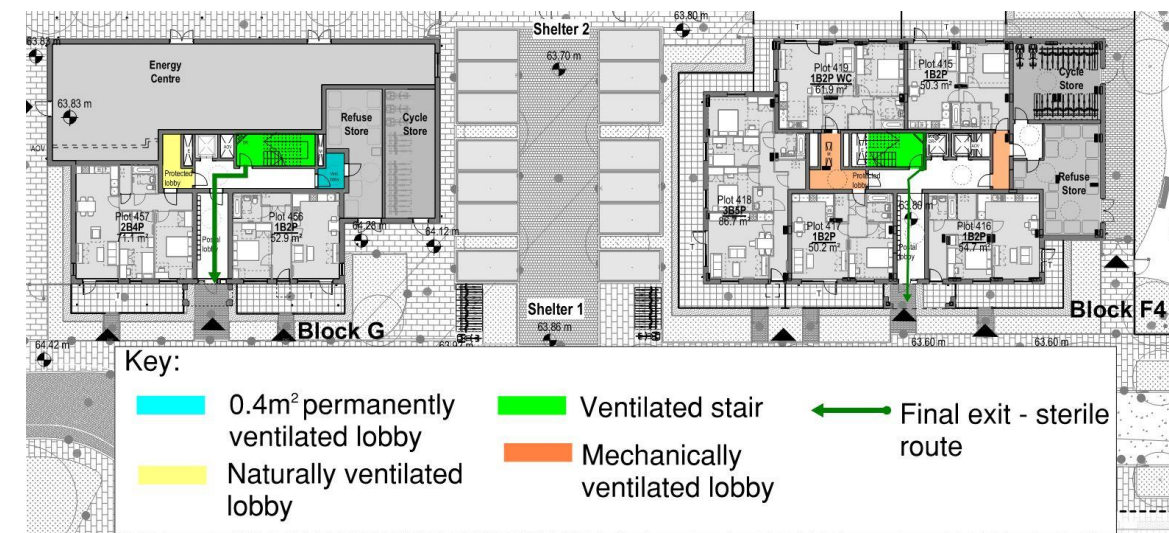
Means of escape direct to outside via protected exit passageway - Block G and F4
